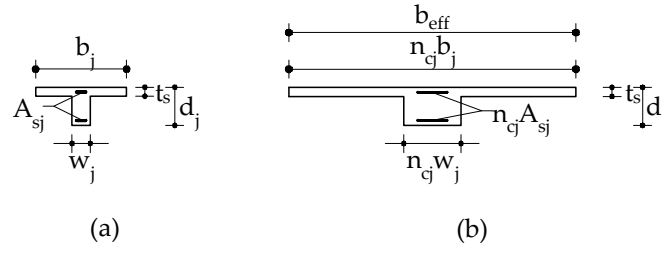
Joist (a) and internal “equivalent beam” (b) section in buildings designed for gravity loads.
